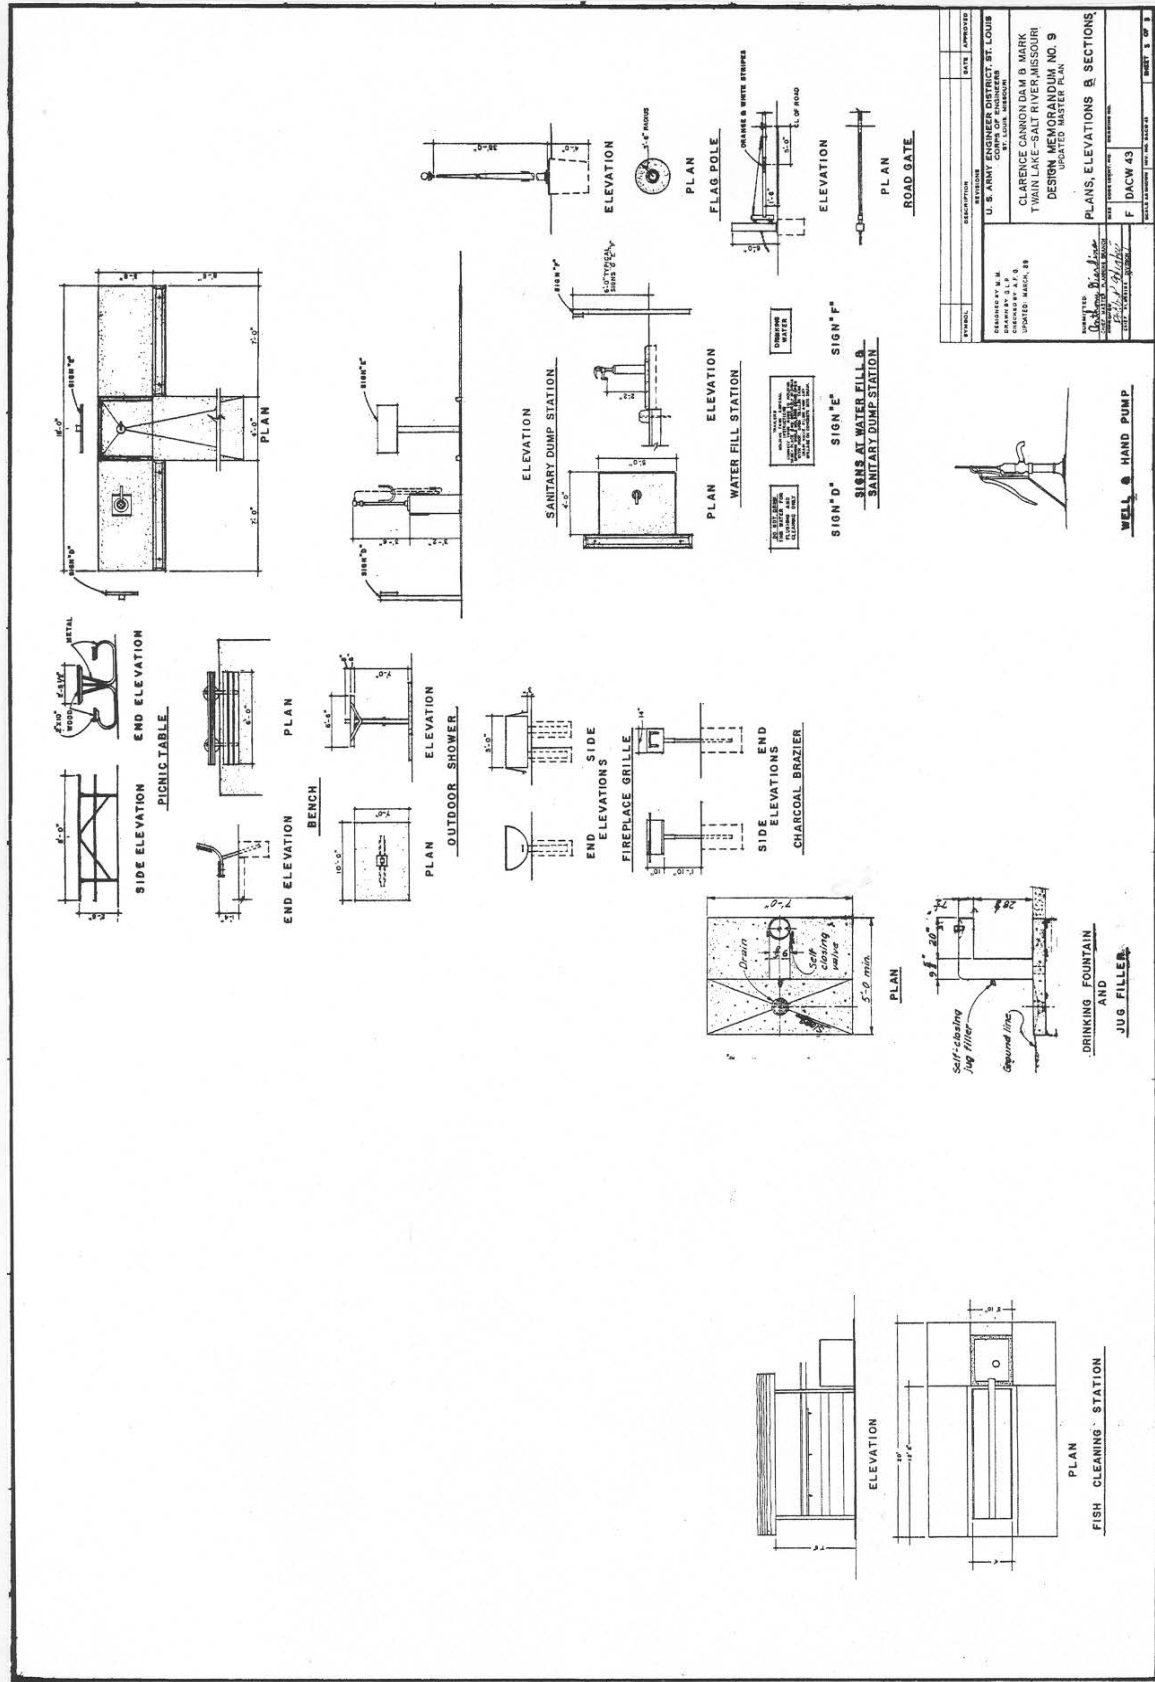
Miscellaneous Plans, Elevations, and Sections cont'd
